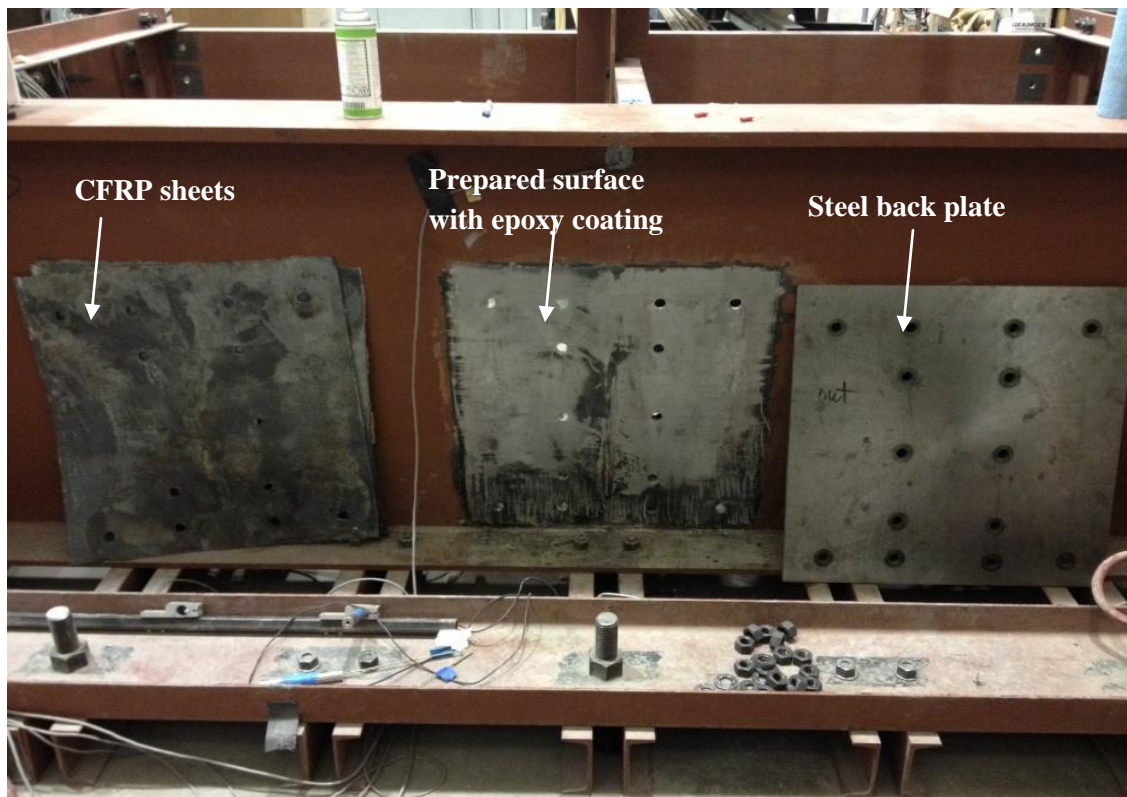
Test Trial 2- view of the exterior face of the girder's web
